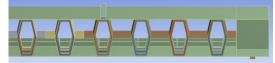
Beam model with Hexagonal folded web plate of three stiffeners, one exterior, one interior and one central stiffener
